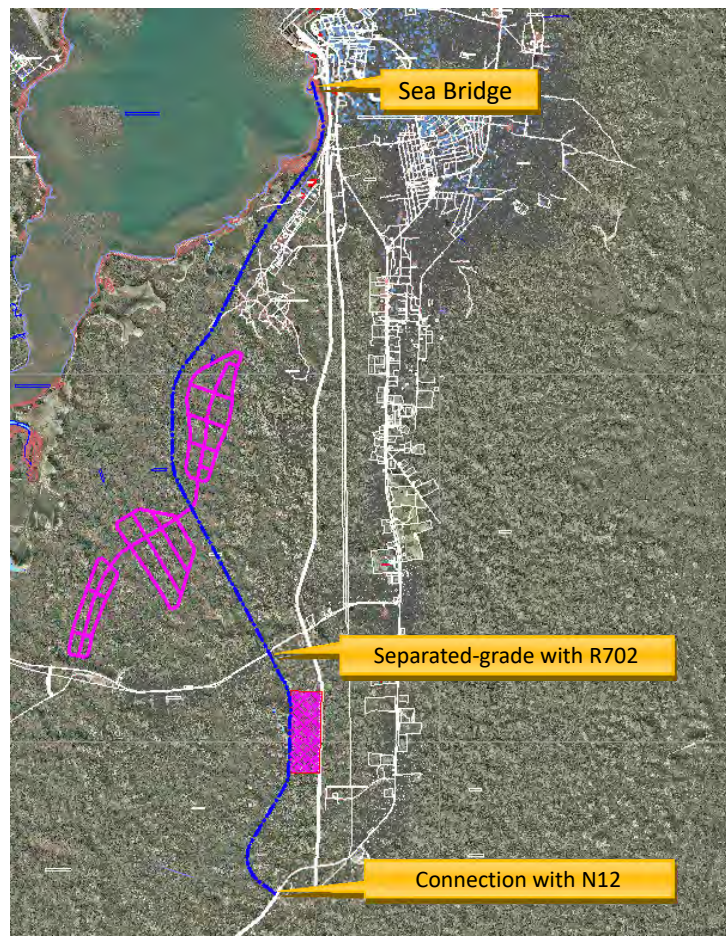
Locations for Structures in the Nacala Port Access Road
